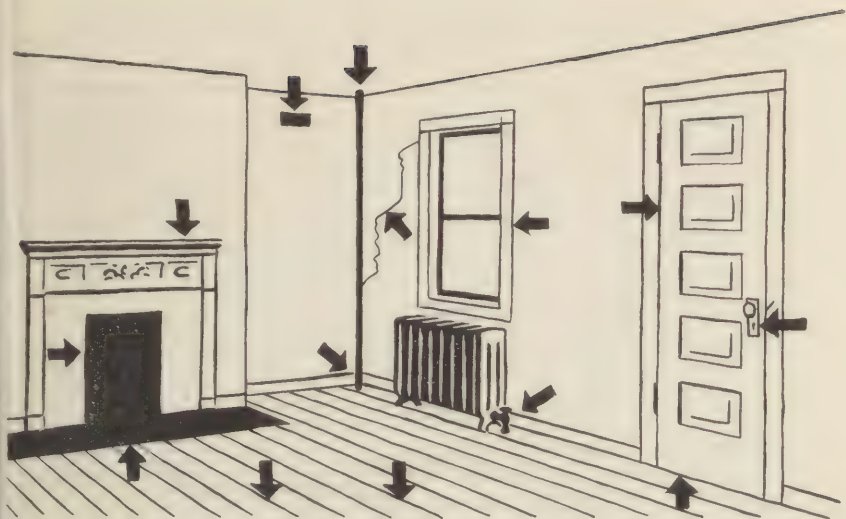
All cracks and openings should be sealed to gasproof a room. Arrows show where to look for cracks and leaks.
